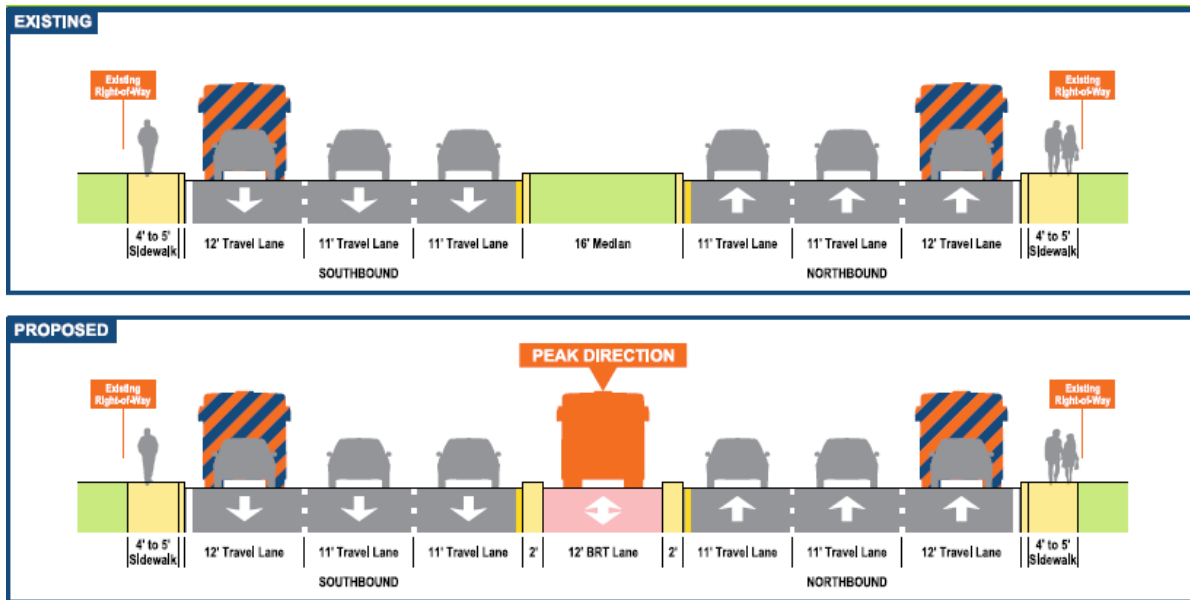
Existing and Proposed Cross-Section from Lockwood Drive to North of Stewart Lane
